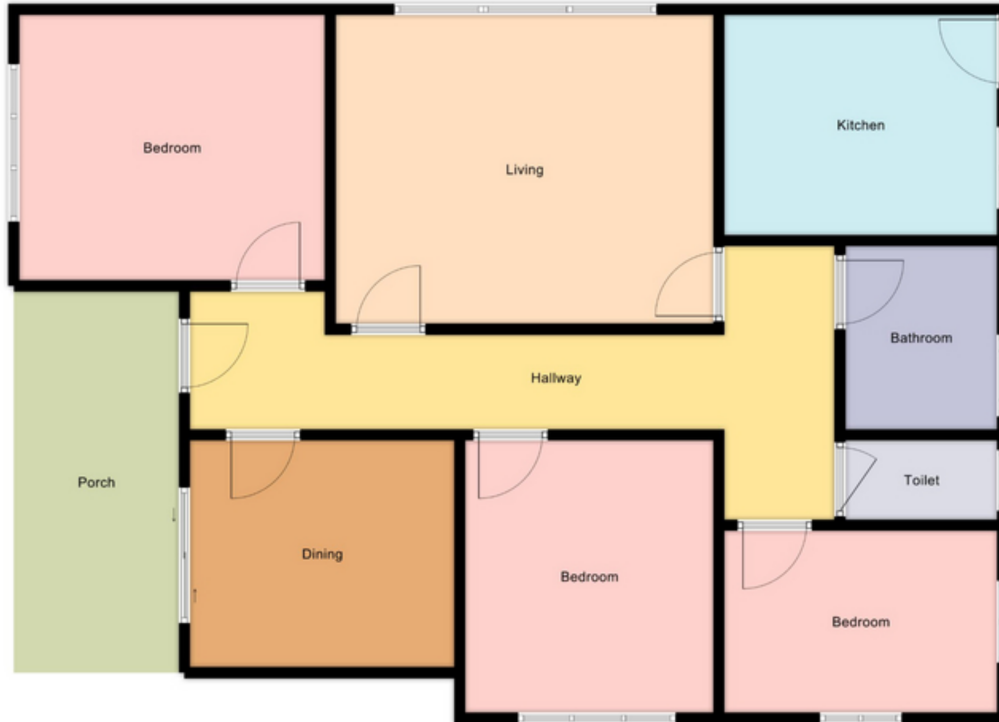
Floor plan of the indoor space that will be used for testing the network stacks. All walls are brick walls of 15cm.
